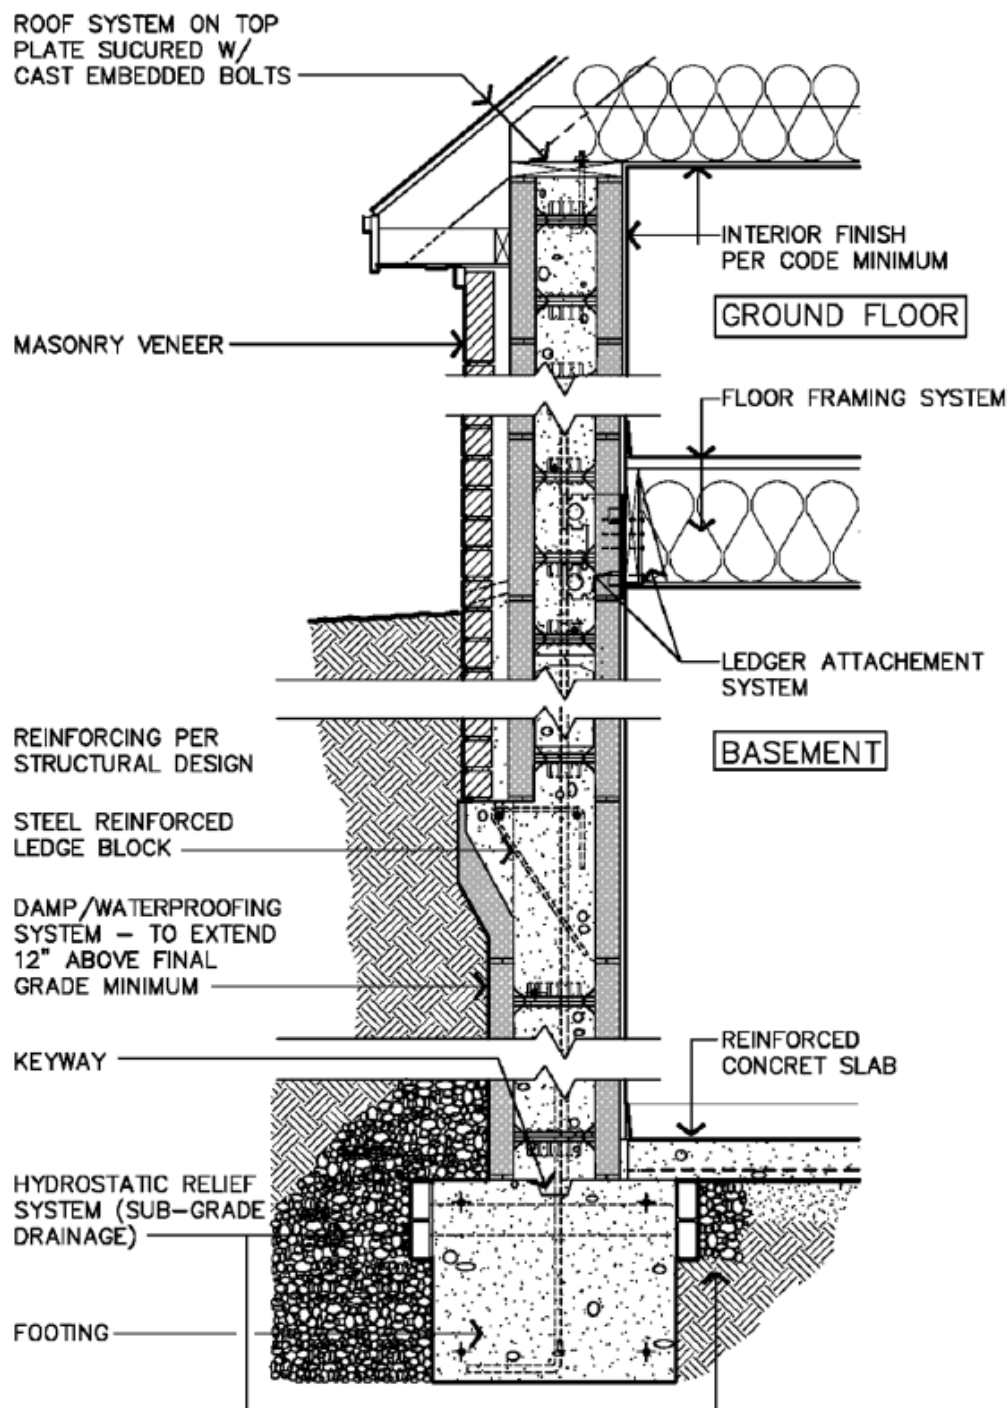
BUILDBLOCK® AND BUILDLOCK® BASEMENT WALL DETAIL (TYPICAL)
